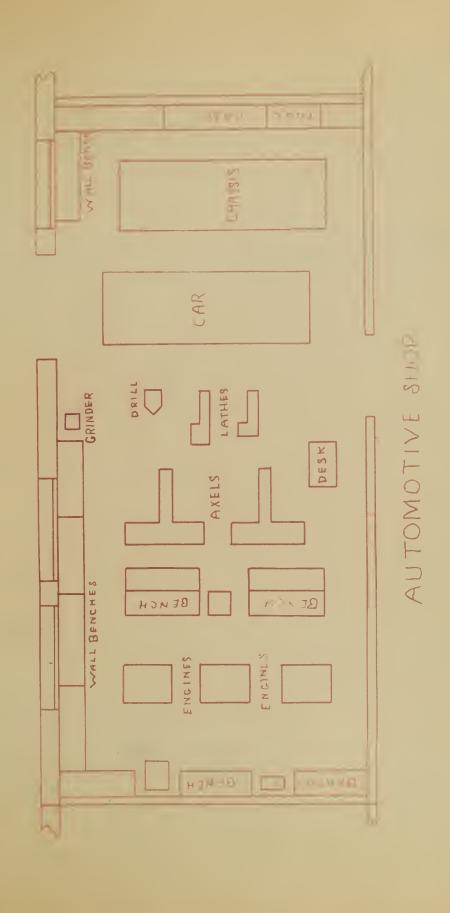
Proposed Floor Plans for the Automotive Shop.
